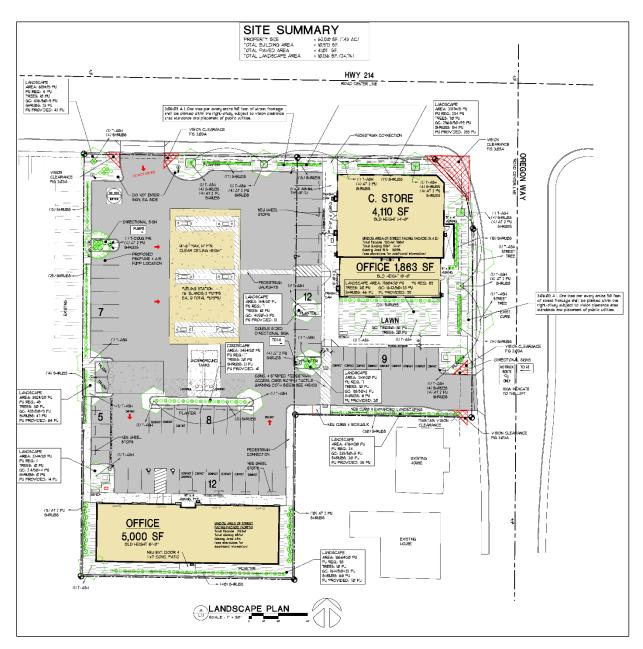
Landscape plan excerpt from Sheet L1.1 submitted February 8, 2024 and with building tan coloring by staff
